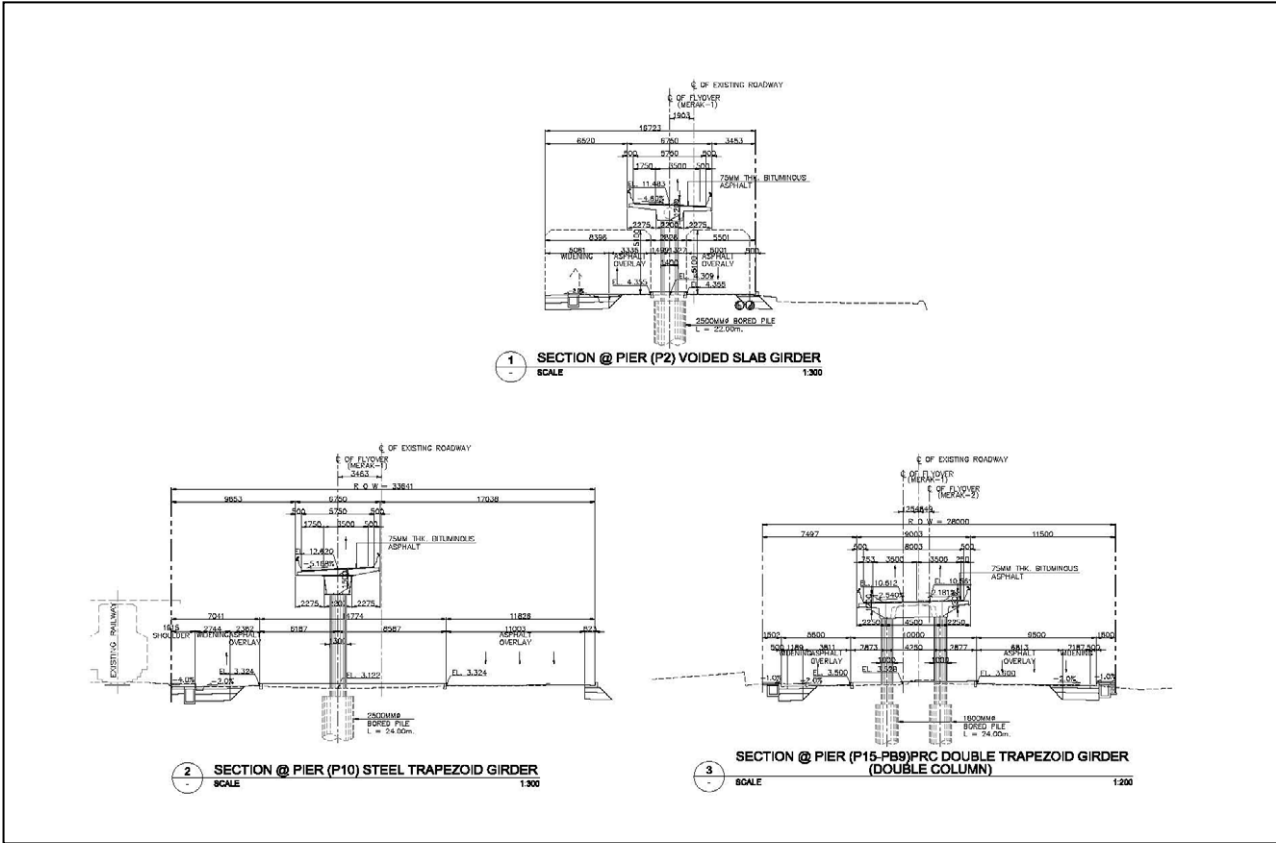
TYPICAL CROSS SECTION (MERAK)
